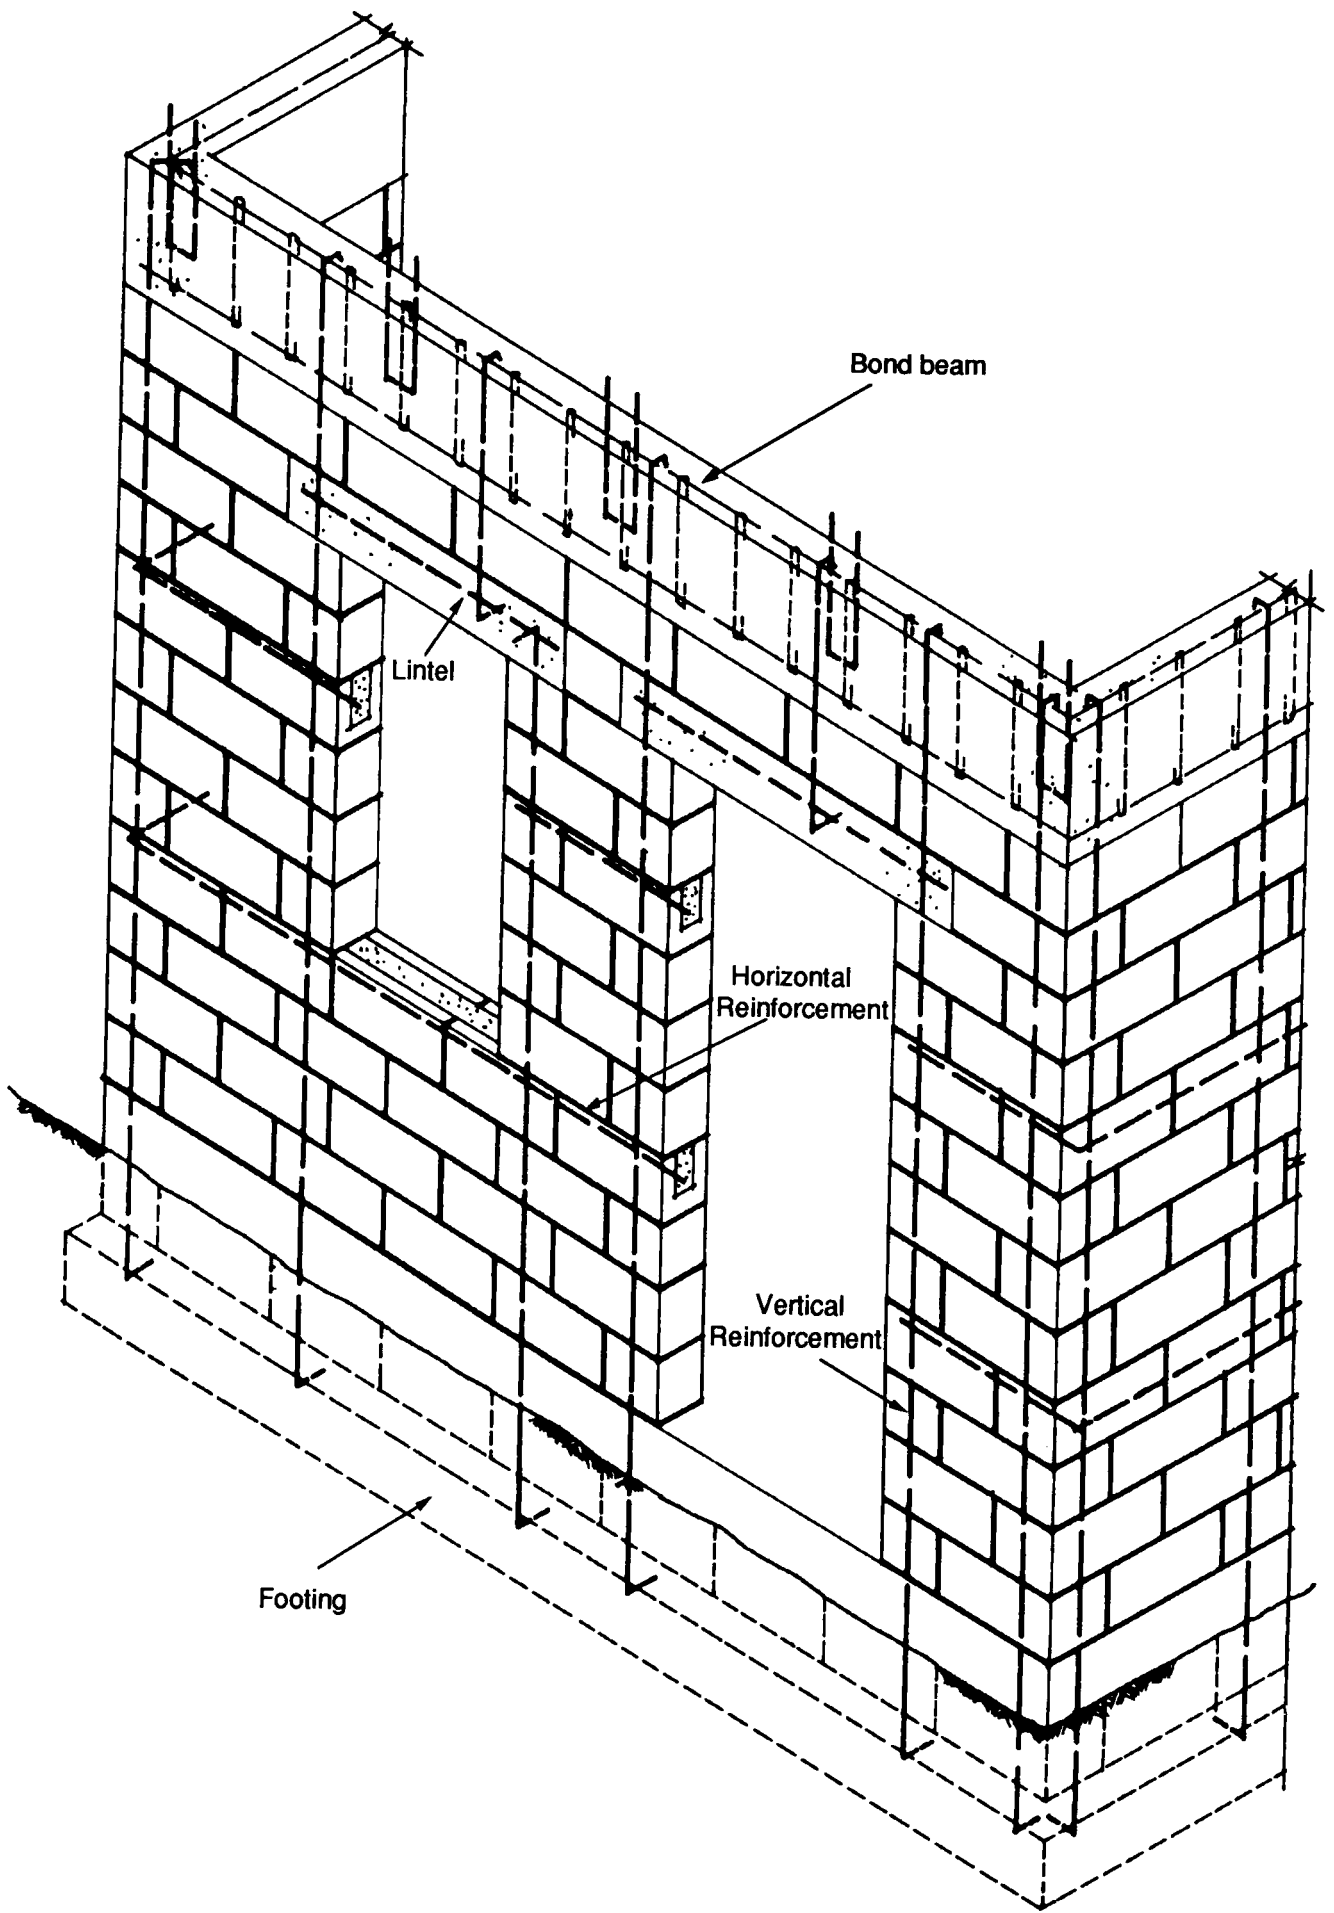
GENERAL CONSTRUCTION DETAILS FOR MASONRY HOUSES
